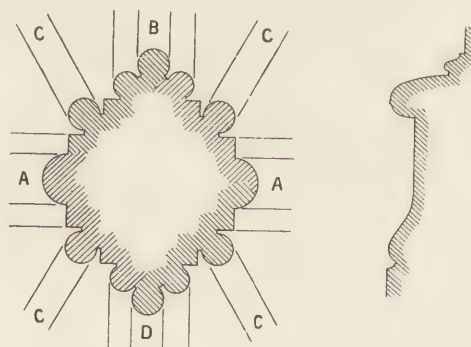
UPSALA CATHEDRAL: PLAN OF ONE OF THE NAVE PIERS
